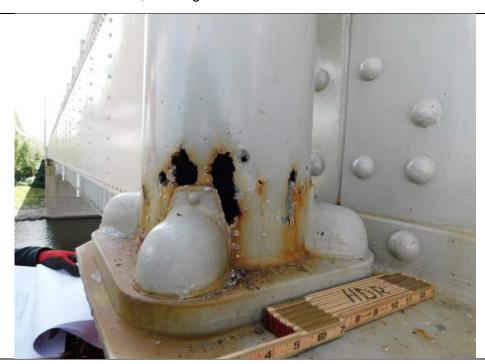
[Span 3] -East side light pole at Floorbeam 18S, holes in base of pole around north half, open hand hole cover above, Looking South
